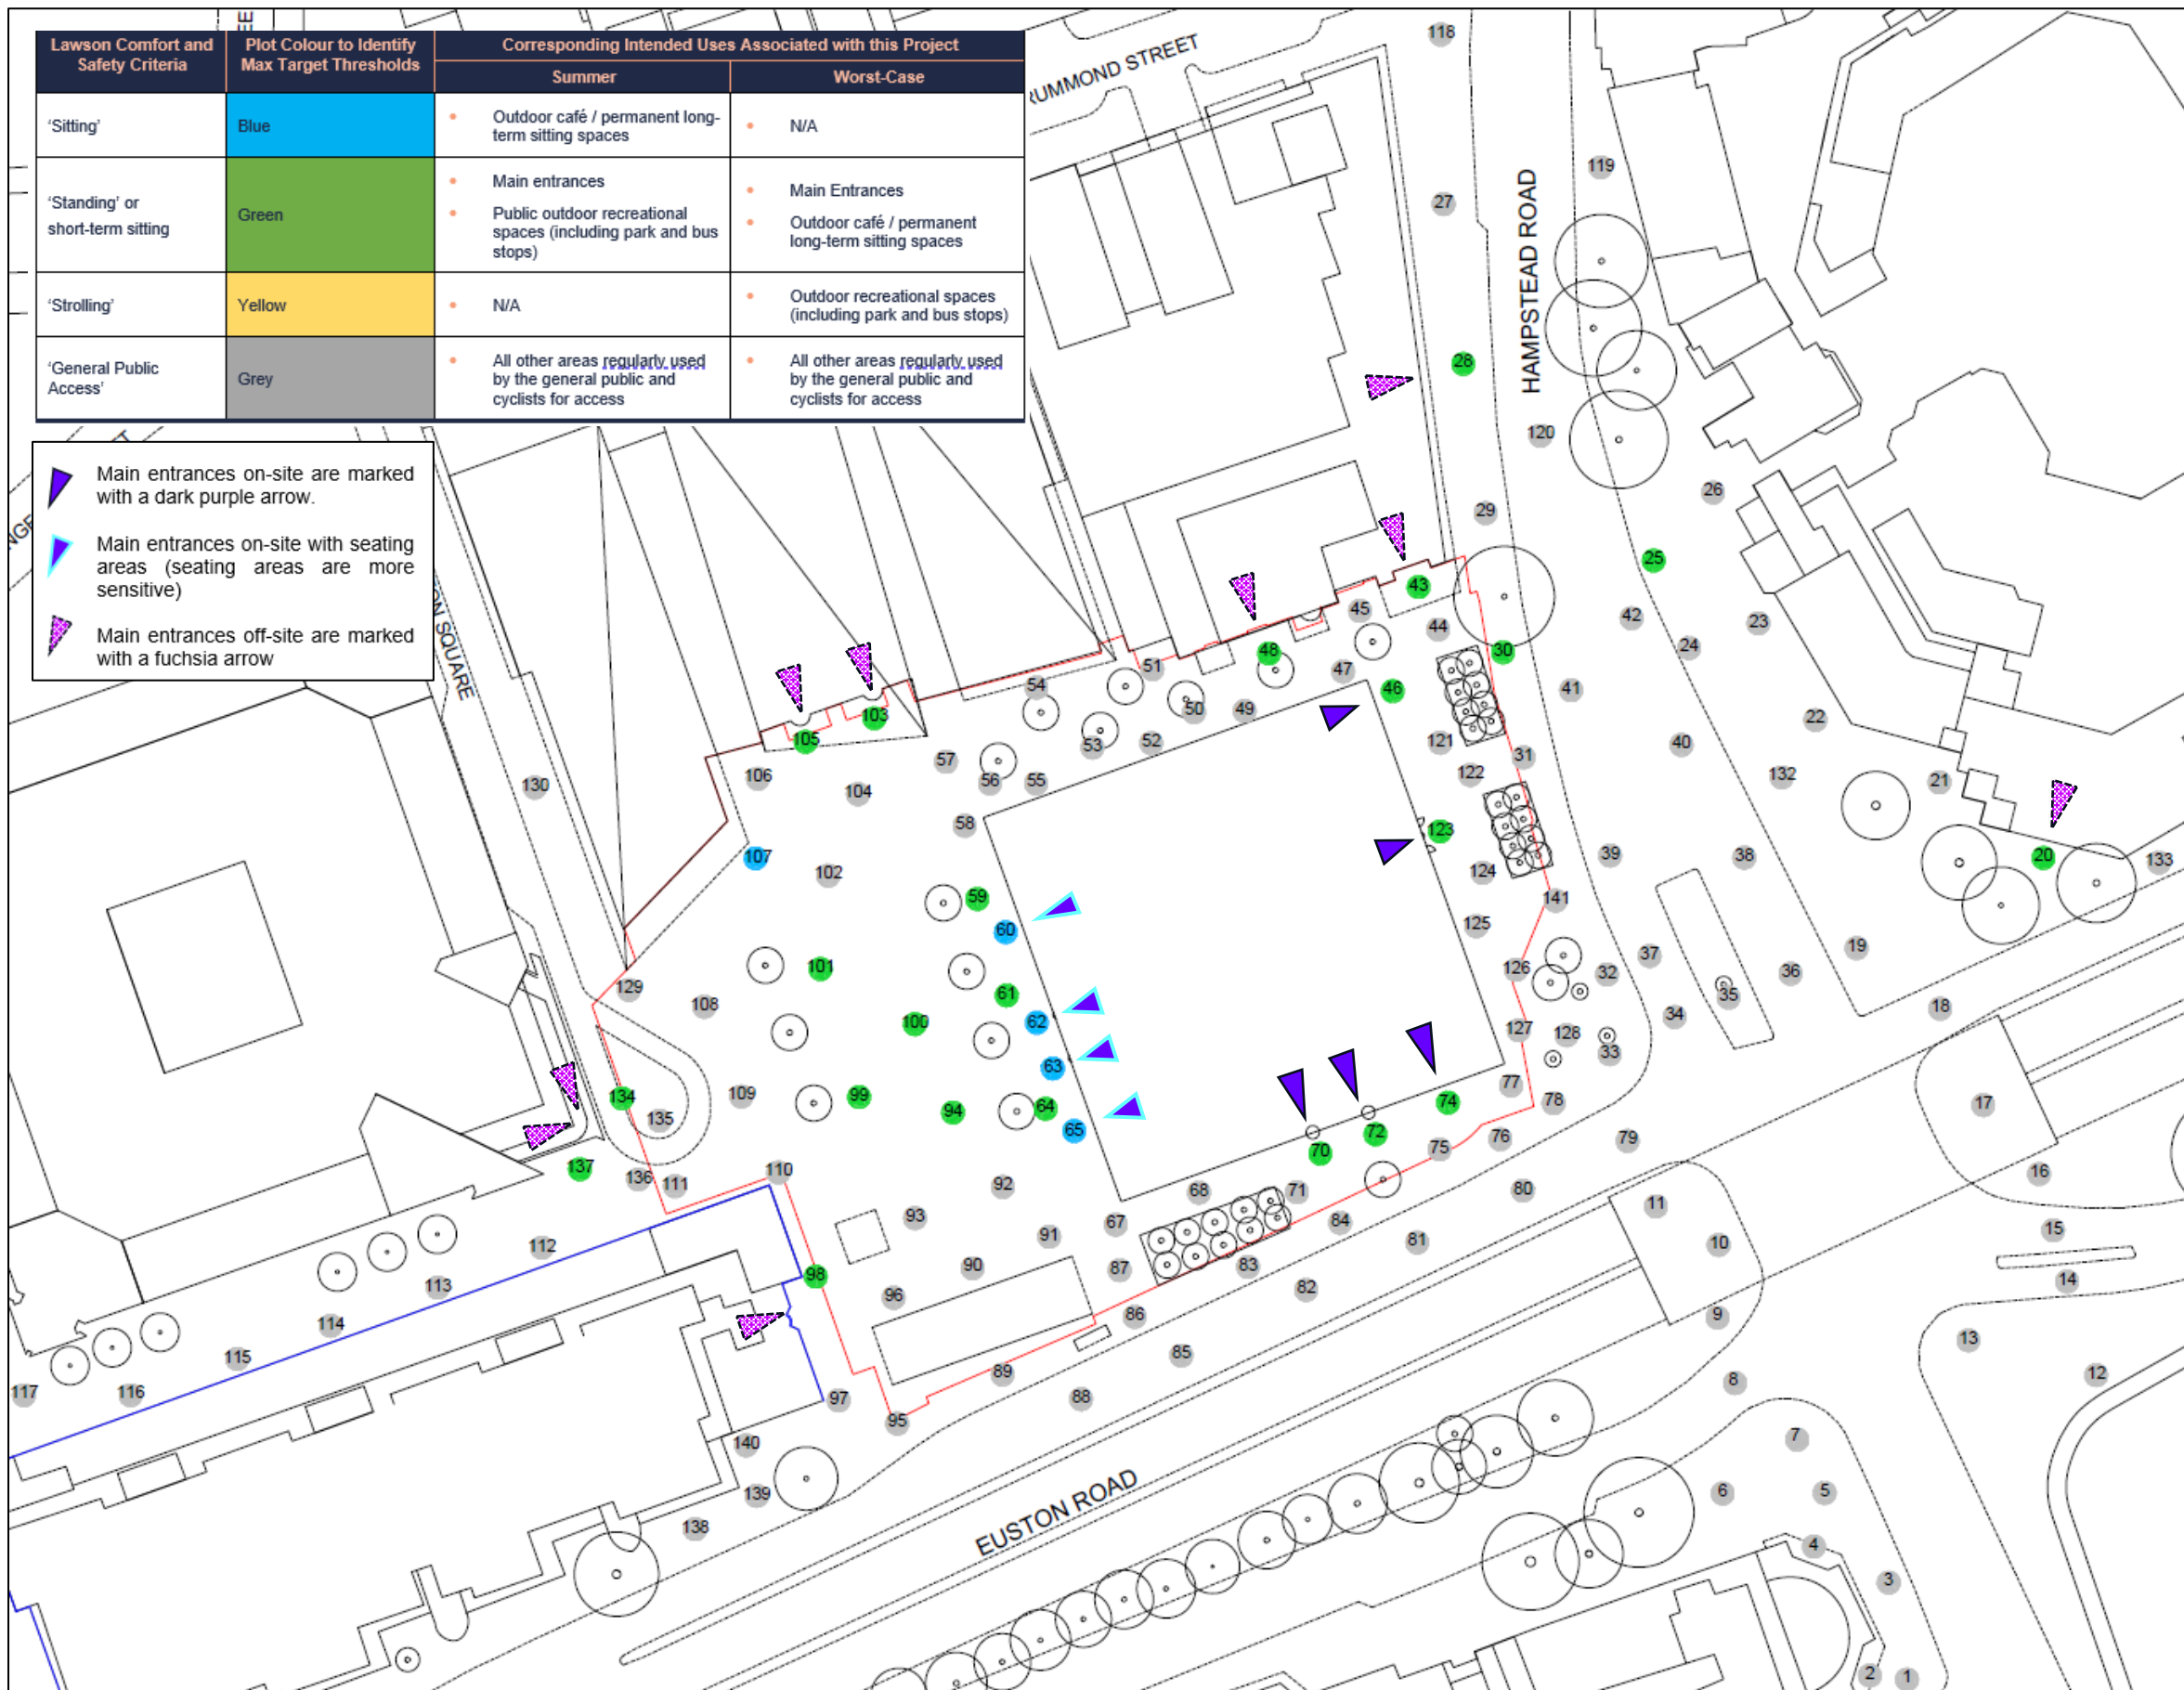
Ground Floor Plan of the Amended Proposed Development Showing the Locations of Entrances.
